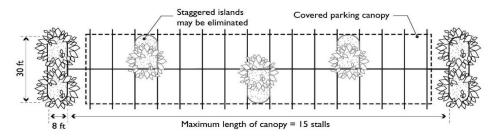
B.5: INTERIOR PARKING LOT COVERED PARKING CANOPY
